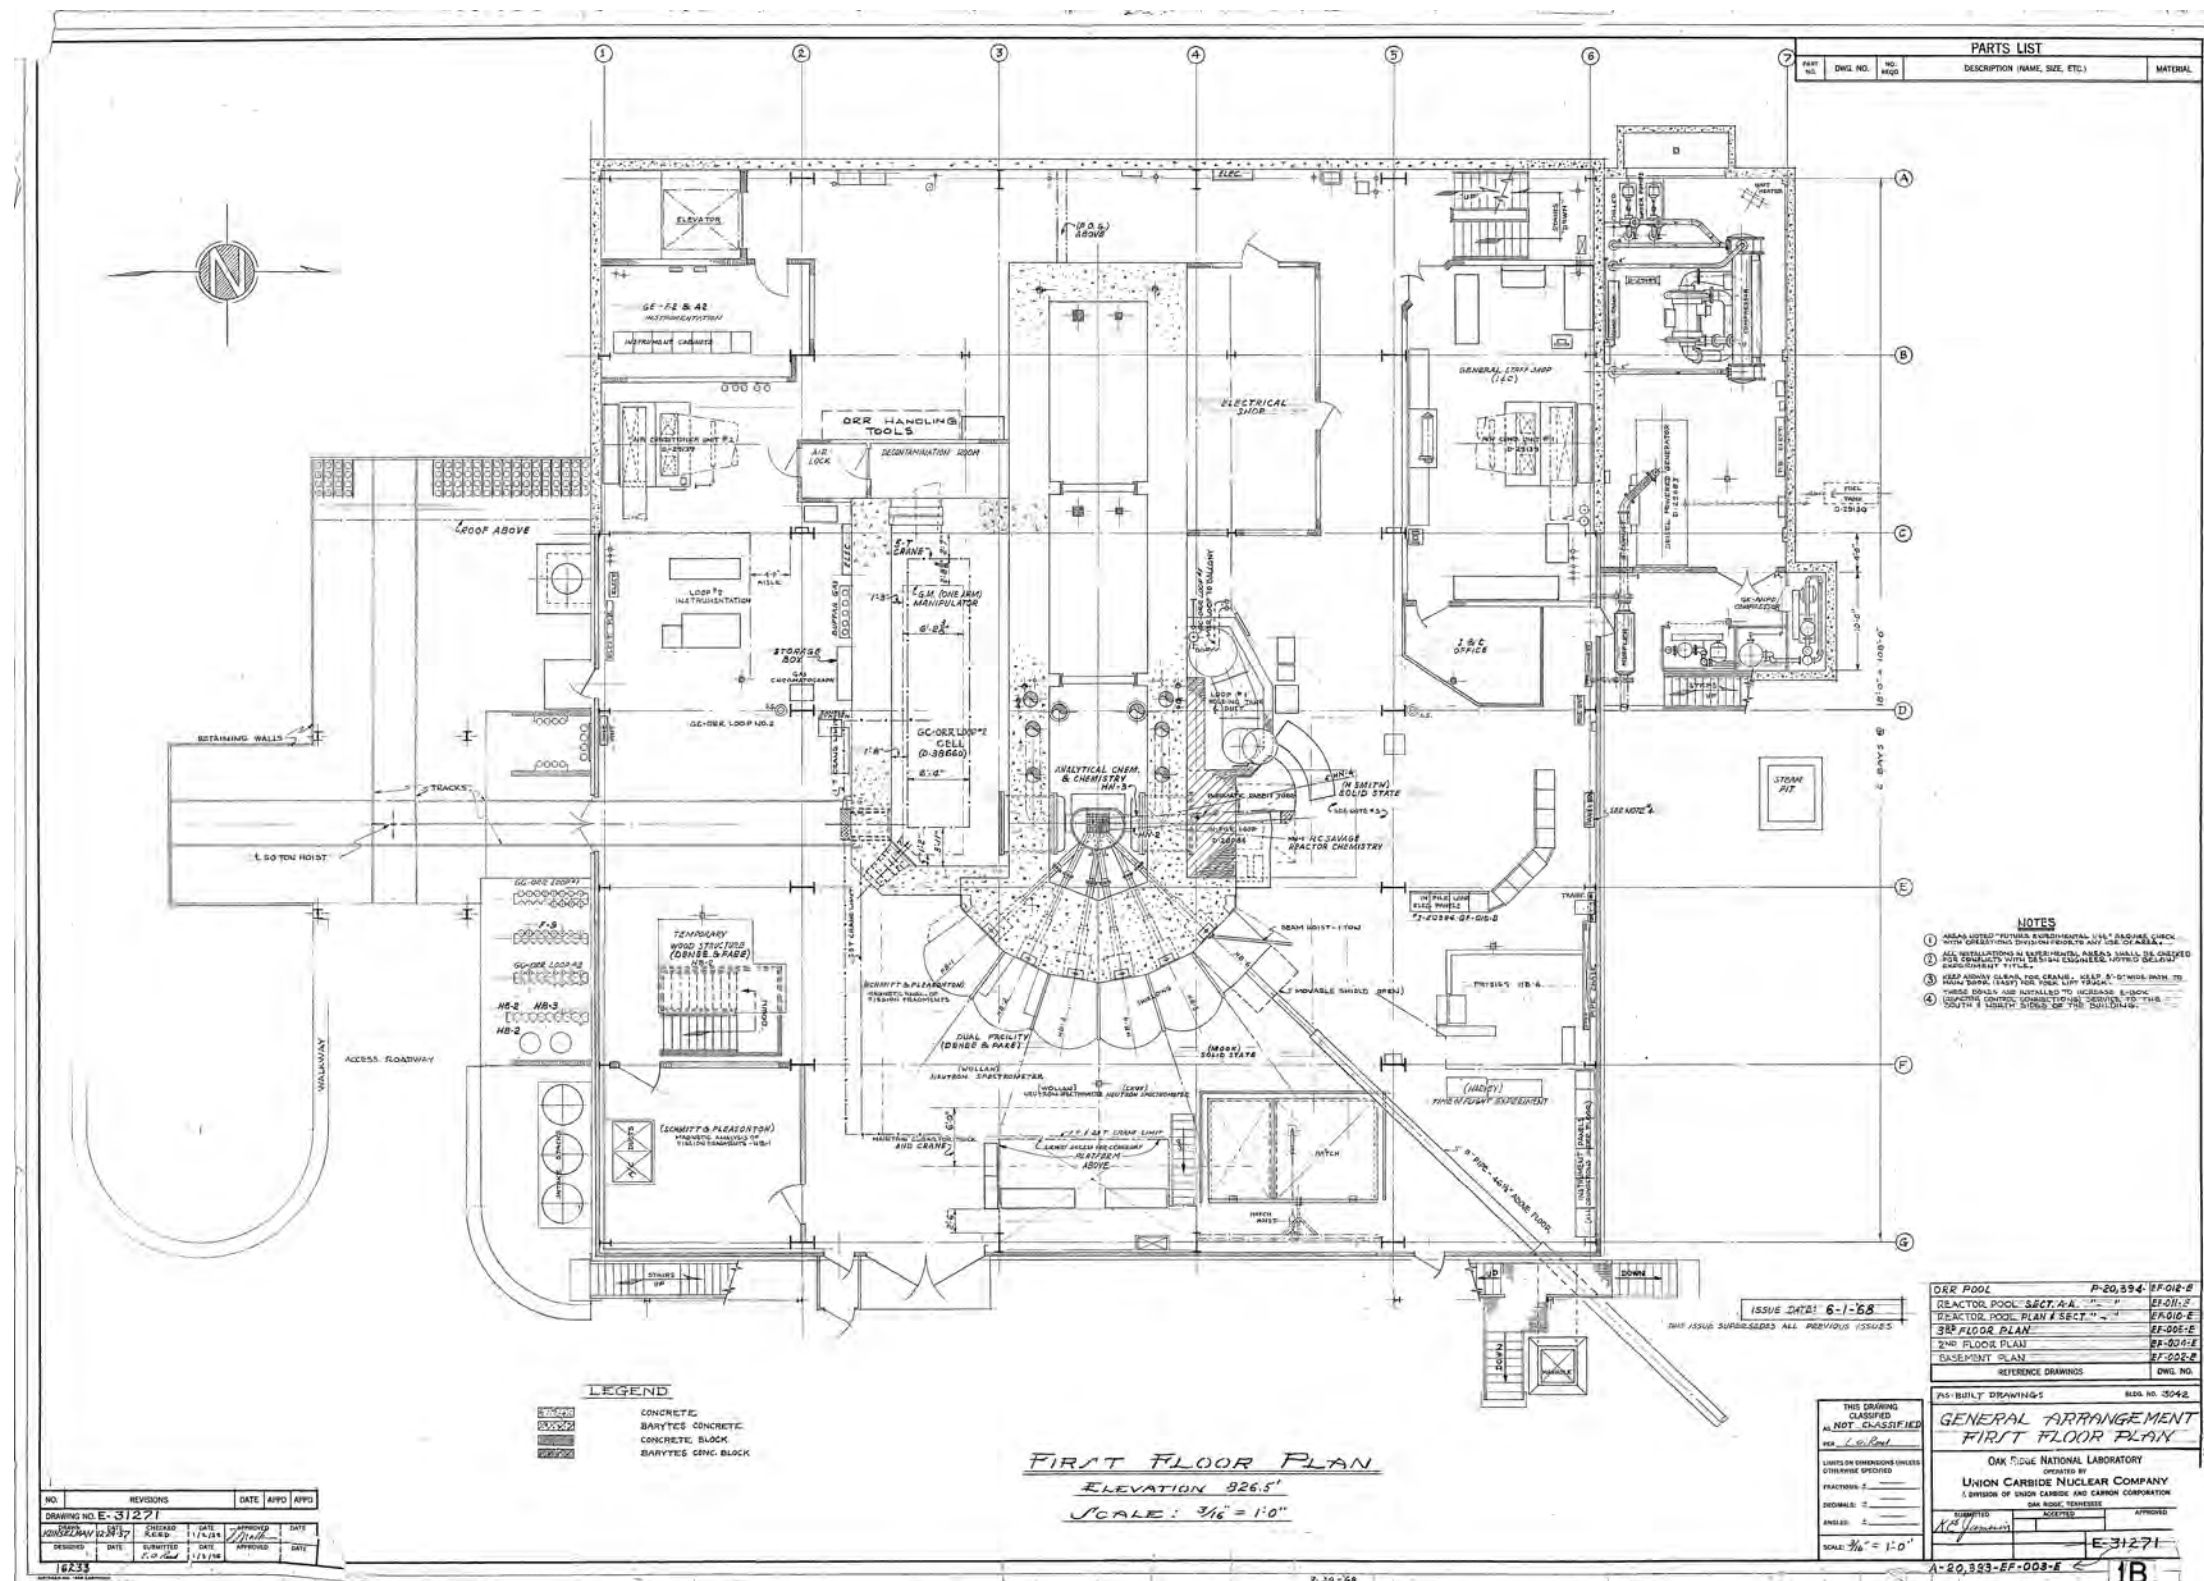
As built drawing showing the general arrangement of the first floor plan in Building 3042 (Oak Ridge National Laboratory, December 24, 1957 [drawn date], June 1, 1968 [issue date, with revisions]).
